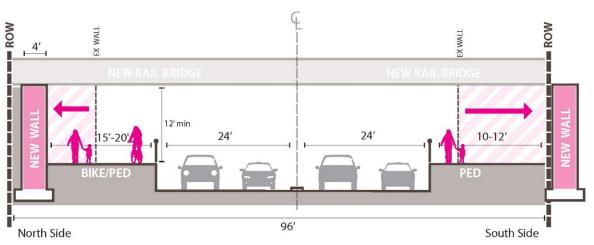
Connect Alameda Underpass Conceptual Cross-Section
